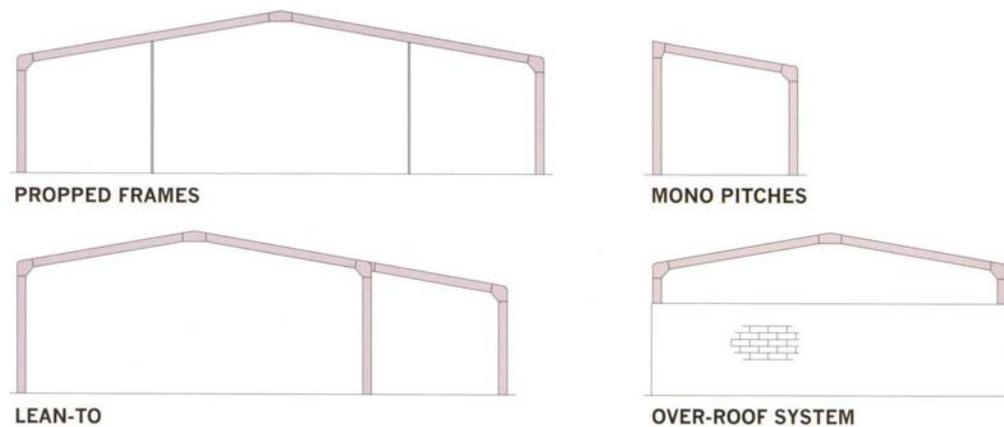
Details of the various framing options available, of particular interest is the over-roof system
